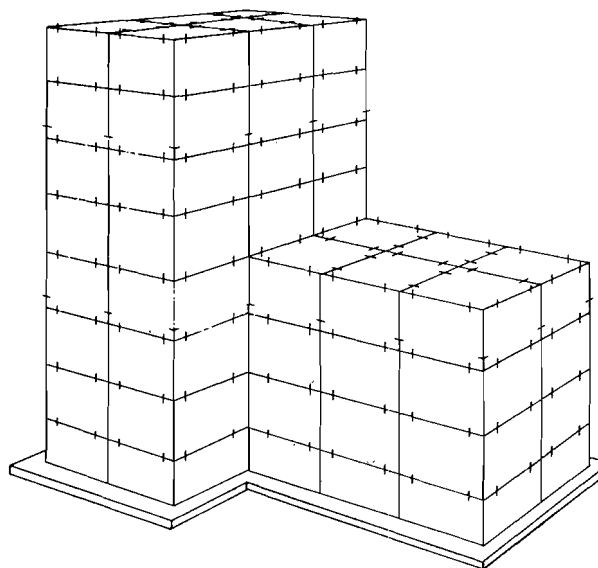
Skeleton of the same building with marked joints between column and beam elements.
